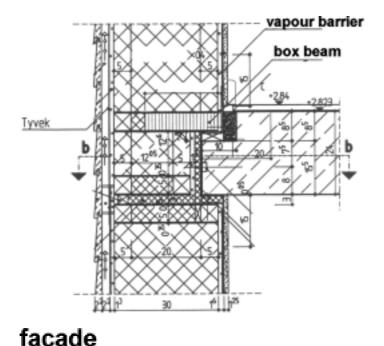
Concrete floor level between the ground floor and first floor (north side)
